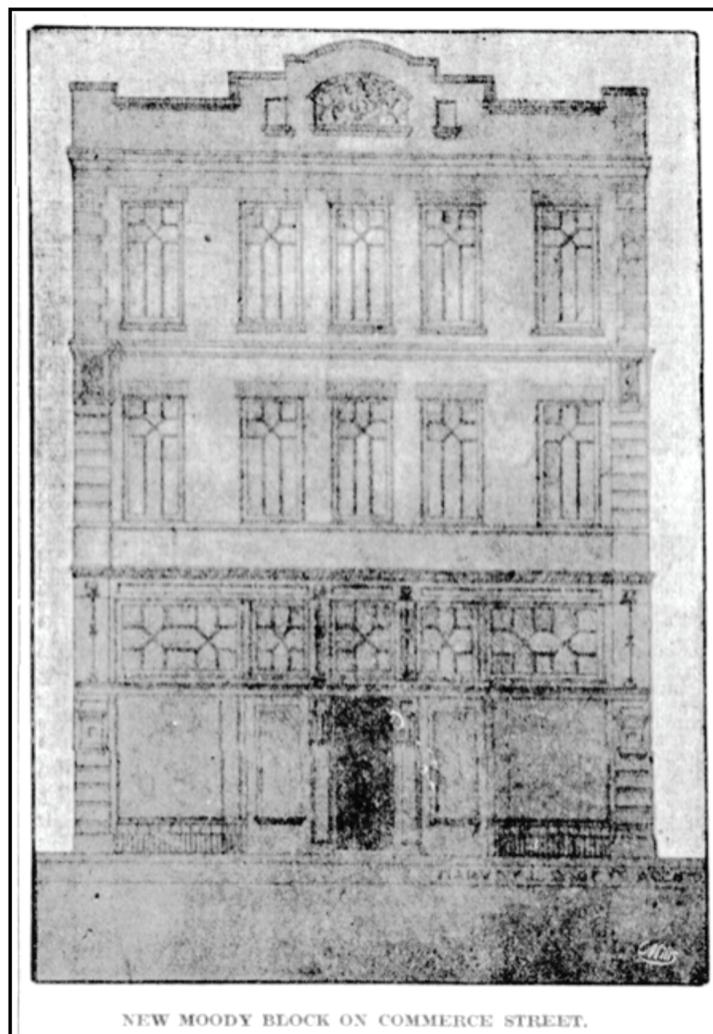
Elevation drawing of Moody Building, San Antonio Light April 2, 1911.
